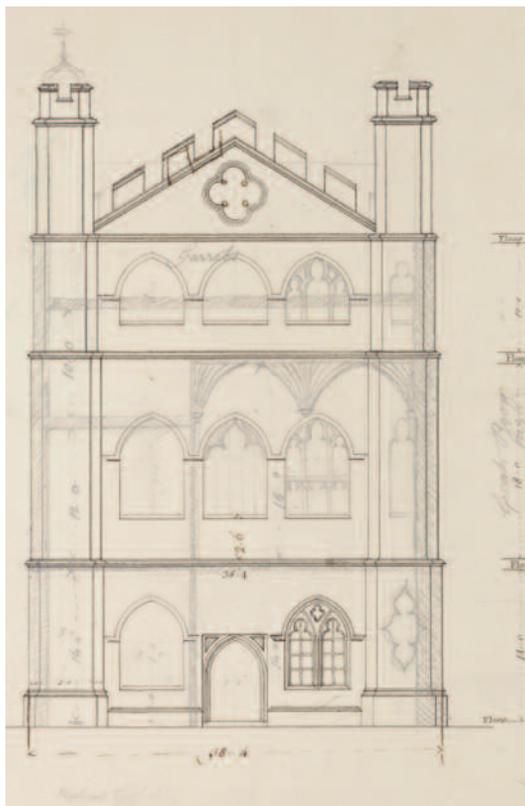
Pomfret Castle, Arlington Street, London: sketch for street elevation of house, by Richard Biggs 1757.
